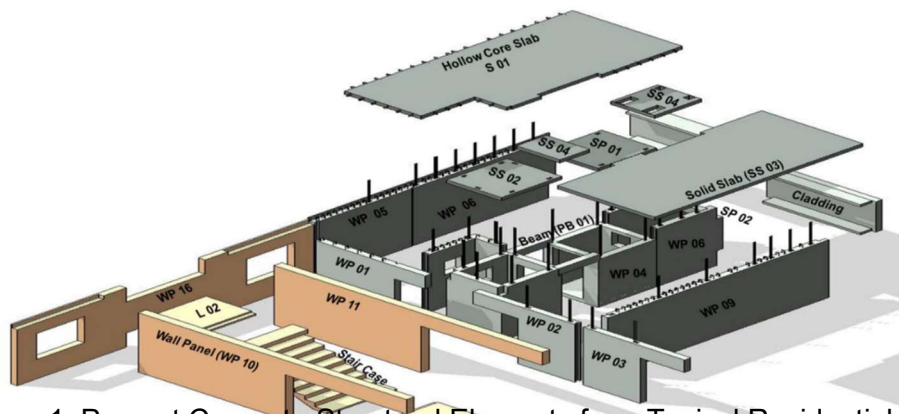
Precast Concrete Structural Elements for a Typical Residential Unit
